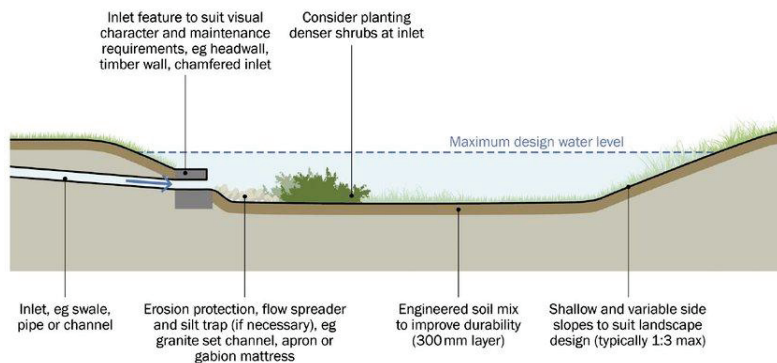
Typical infiltration basin detail (Source: CIRIA C753)
